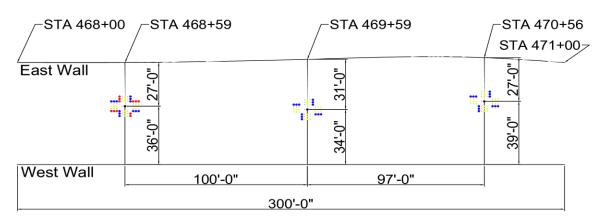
Project Site #1 I-95 - Test site location sketch
